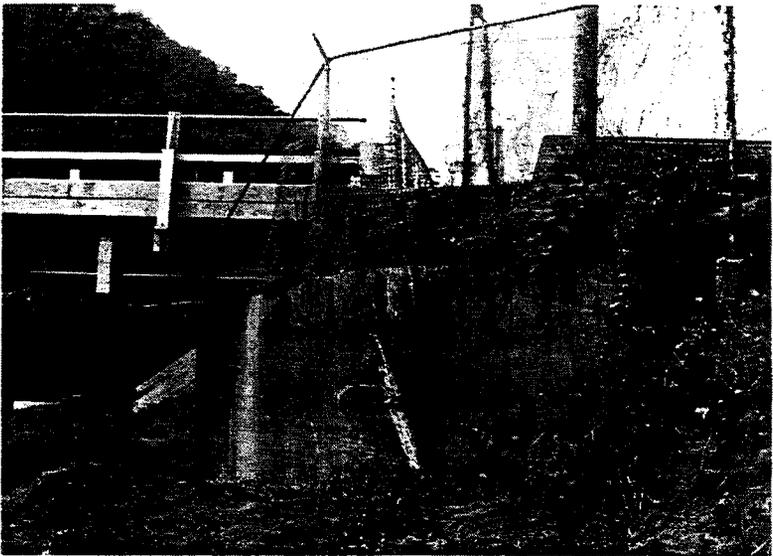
The APCO bridge left abutment. The tieback wall will be contiguous to this abutment.
